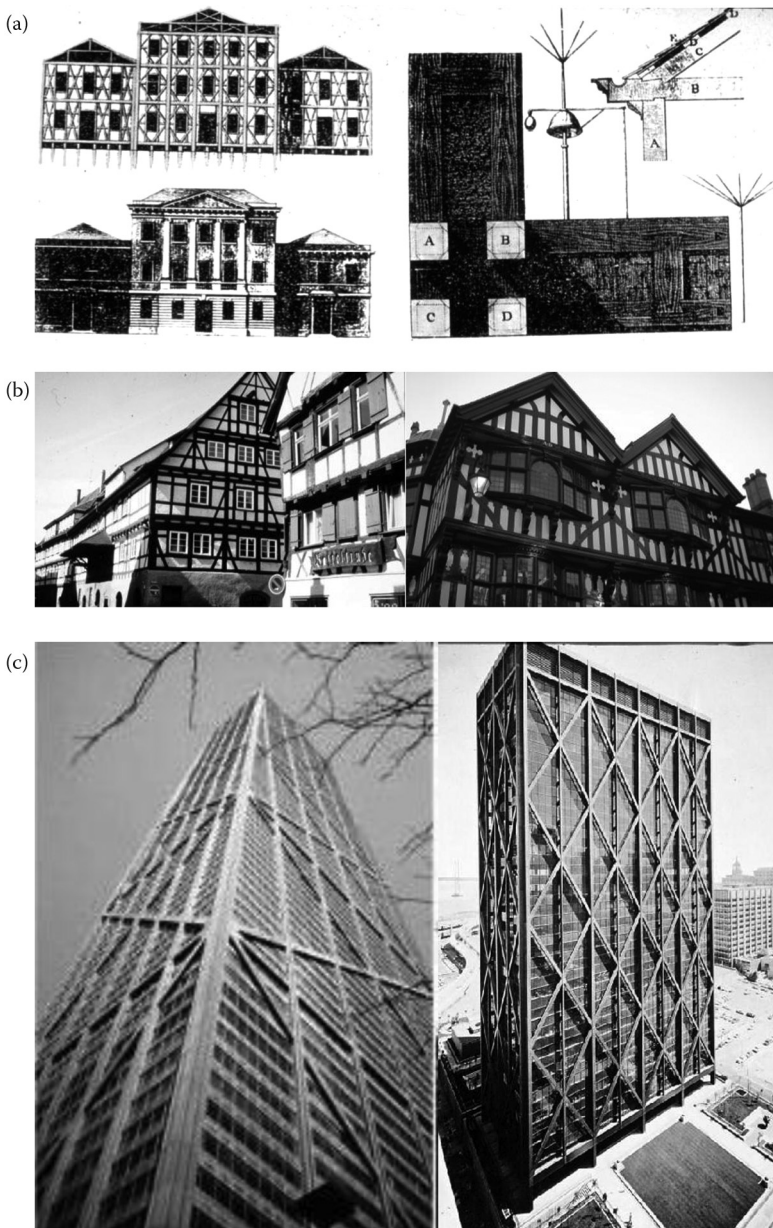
Evolution of bracing systems: (a) case baraccate; (b) north European houses; (c) modern-braced buildings.
